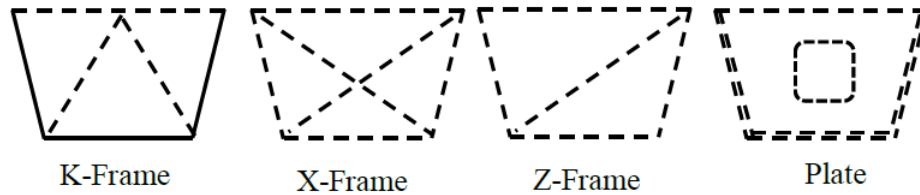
Internal Intermediate Cross-Frame Layouts-Tub Girders(Helwig and Yura 2012)
